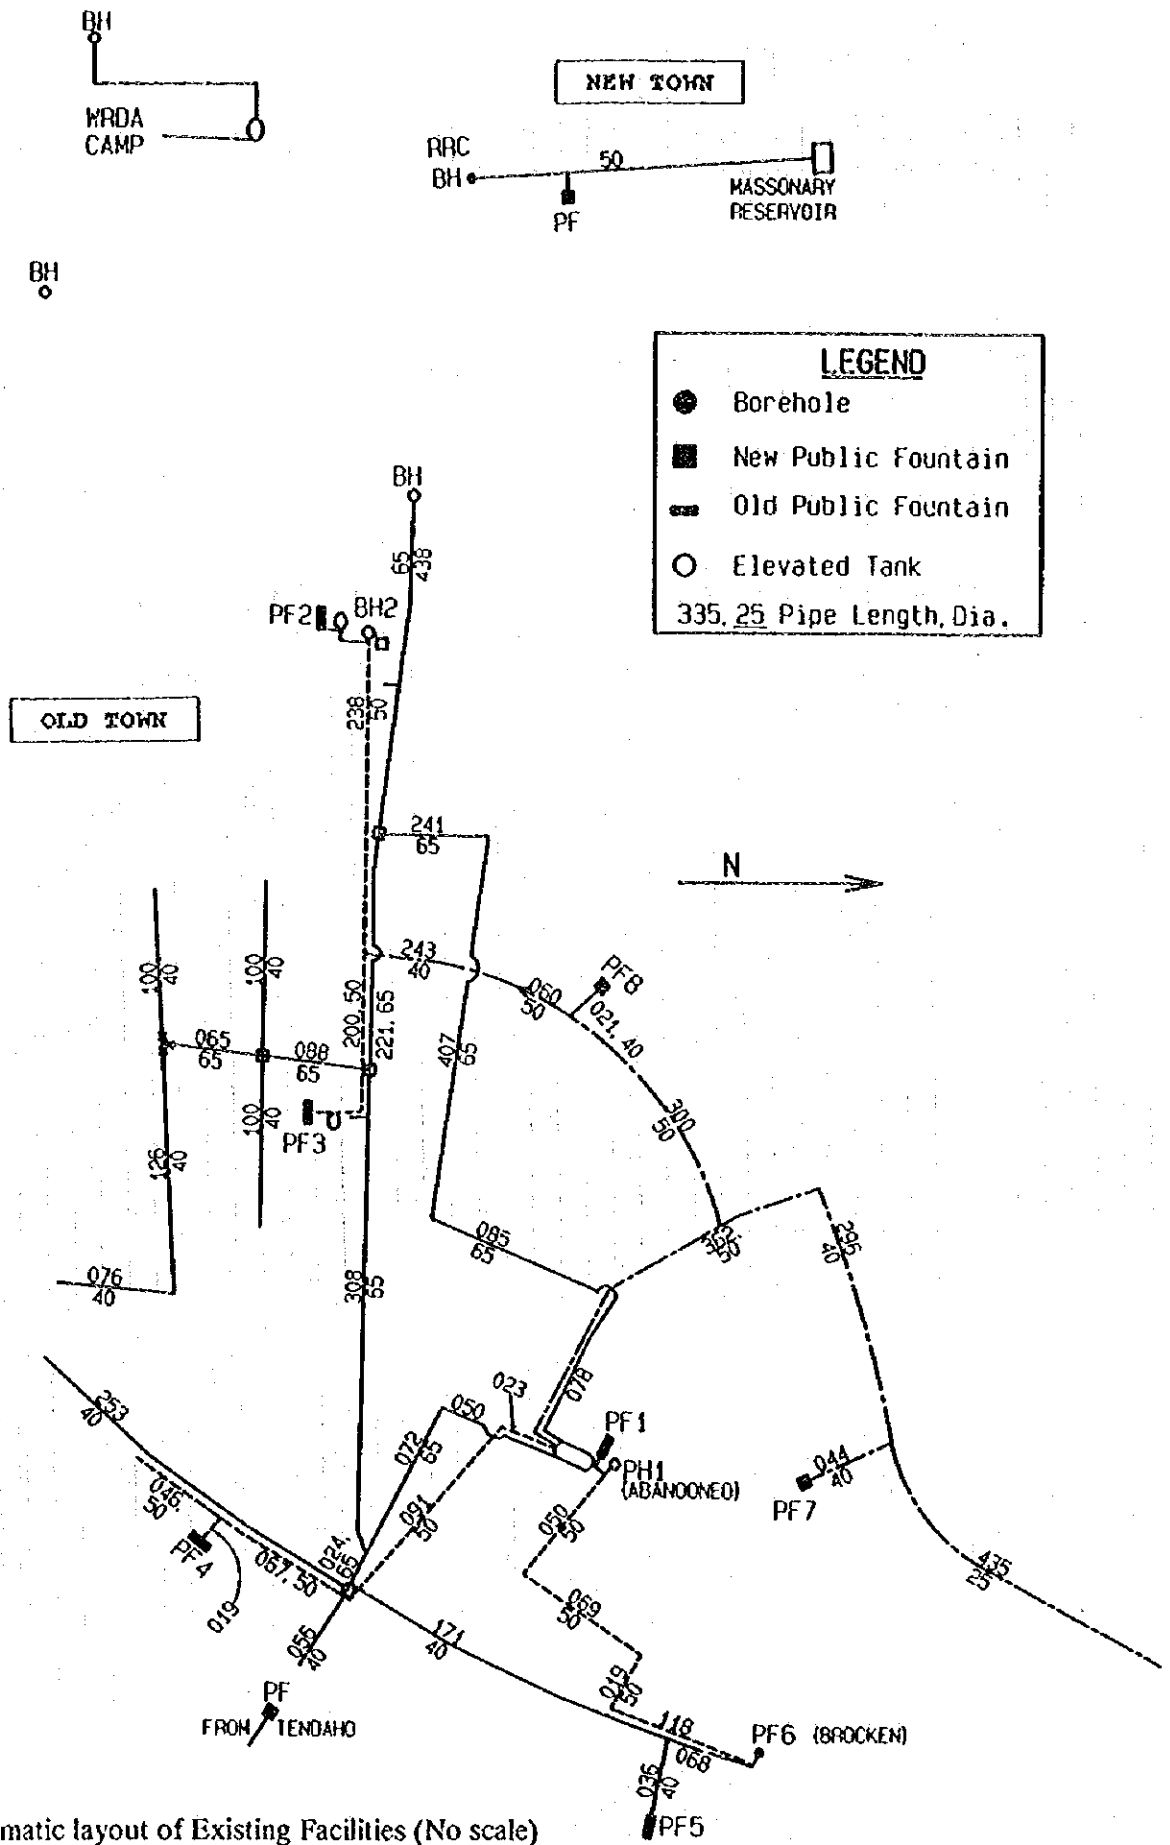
Schematic layout of Existing Facilities (No scale)
